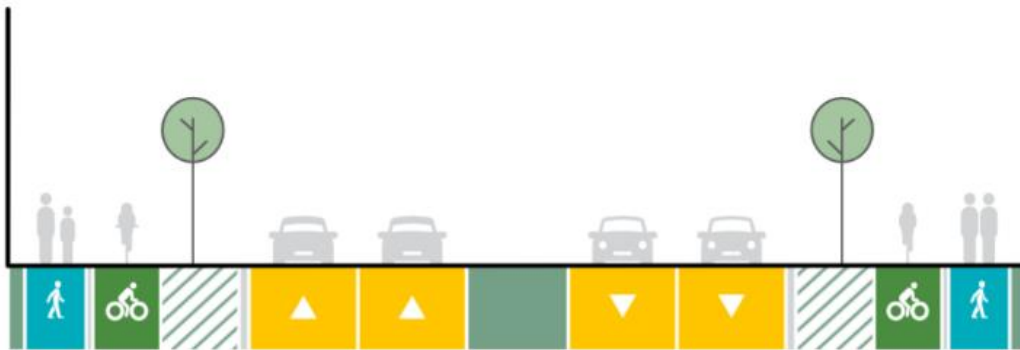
Indicative Cross Section Brigham Creek Road between Totara Road and Tamatea Road
